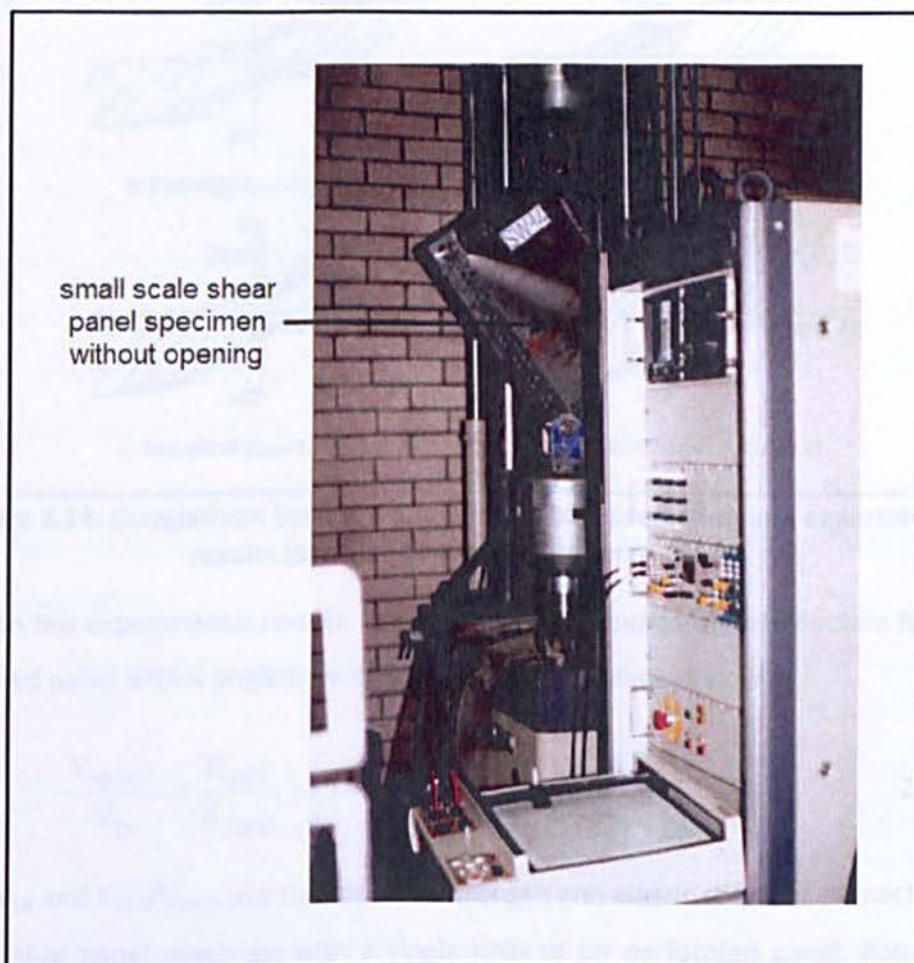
Servo hydraulic testing machine (Sabouri-Ghomi and Roberts, 1991)
